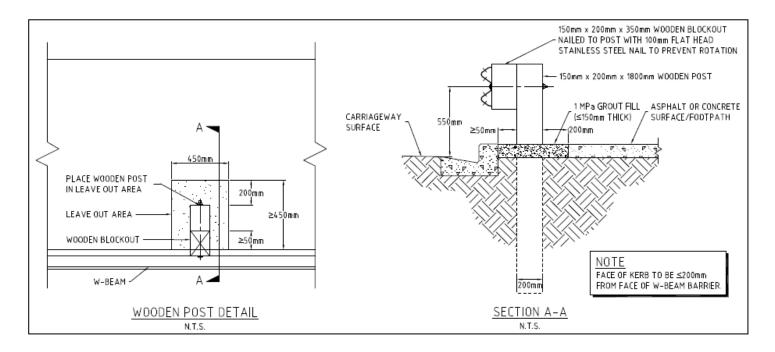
Recommended installation of post rotation area around guardrail posts in hard surfaces
